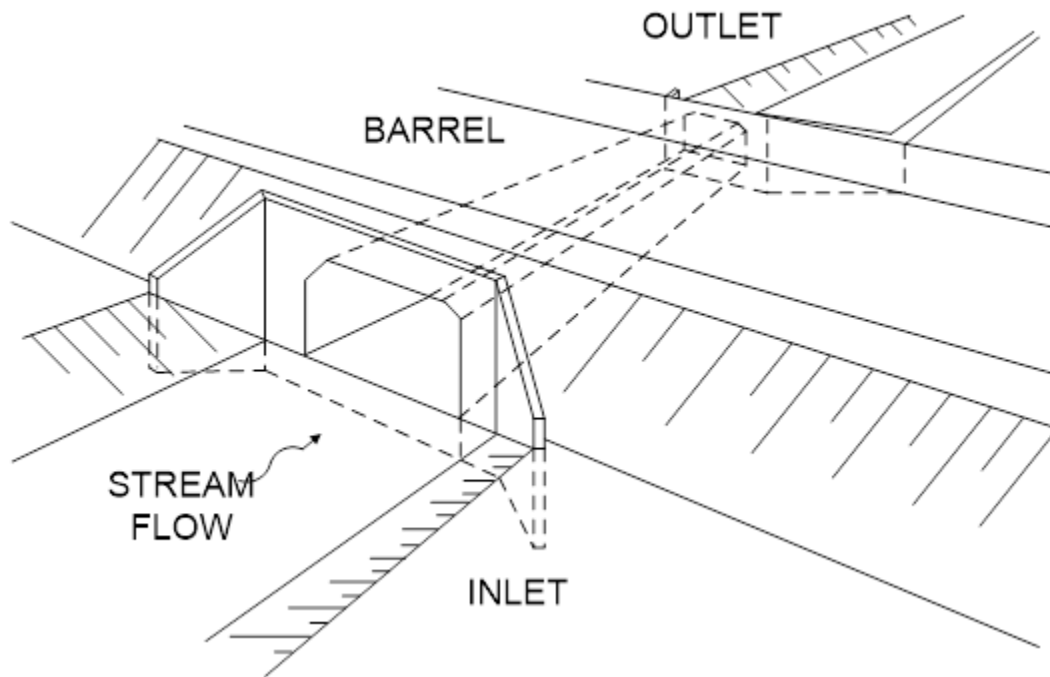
Basic Culvert, Tunnel, and Soil-Steel Structure Components
